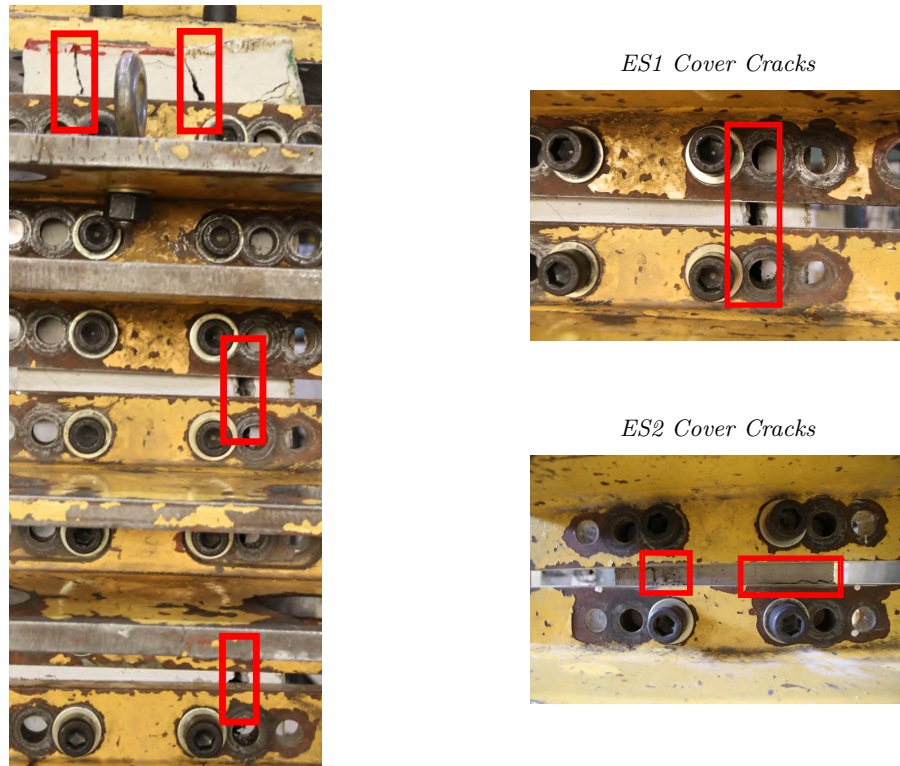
Visible Cover Spalling at Specimen Edge
